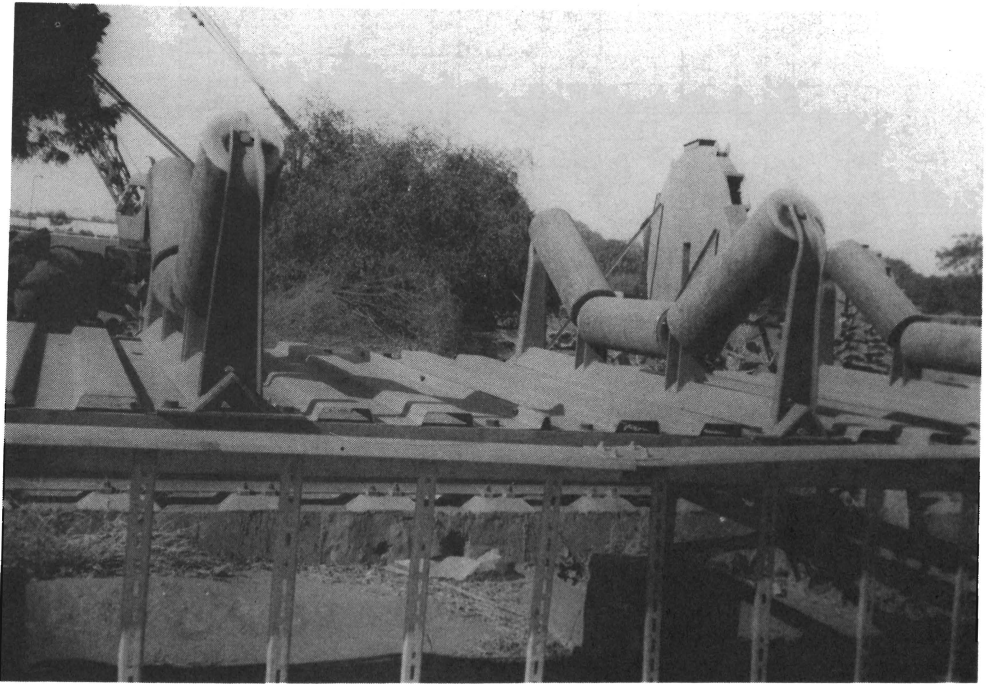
Decking Plates installed at Gandhinagar TPS/CHP
